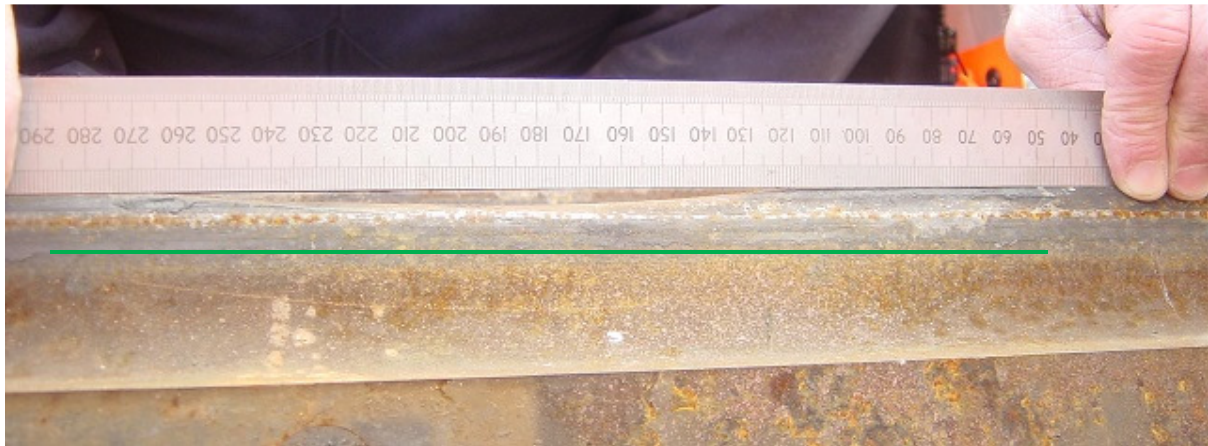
Example of damaged switch rail (photos 3 and 4)
